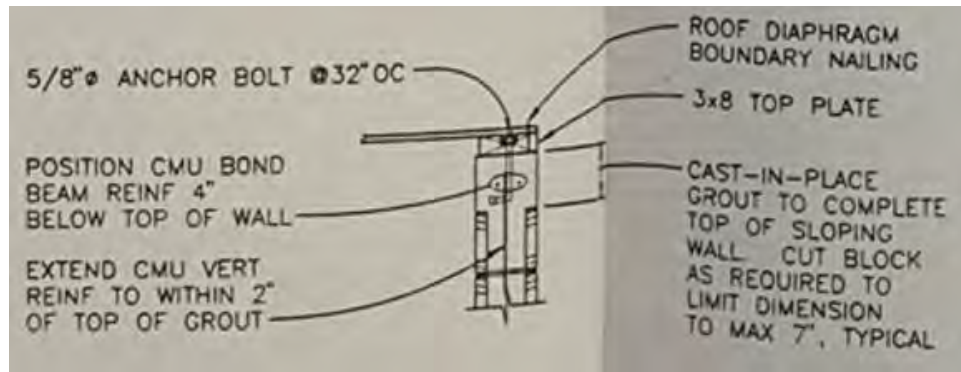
Inadequate East and West Wall Out-of-Plane Anchorage
